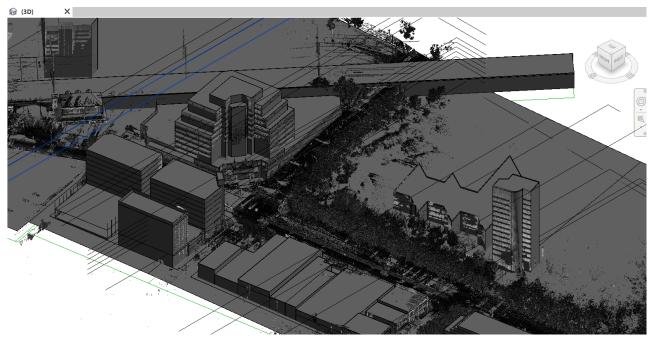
3D View of Building and Road Surface Model in Autodesk Revit
